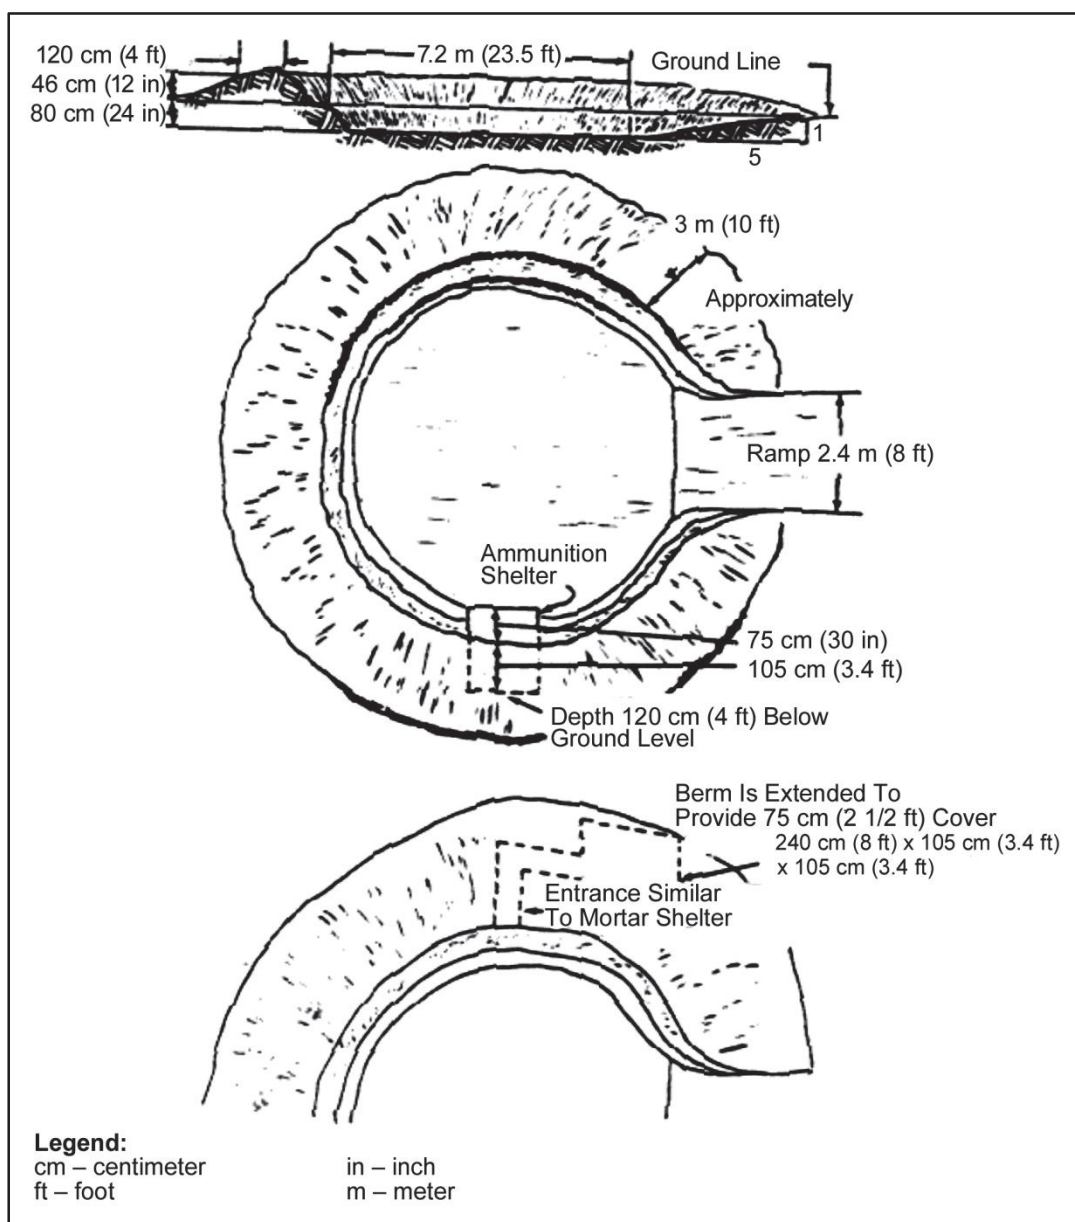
Towed howitzer emplacement (105-millimeter and 155-millimeter howitzer) layout
